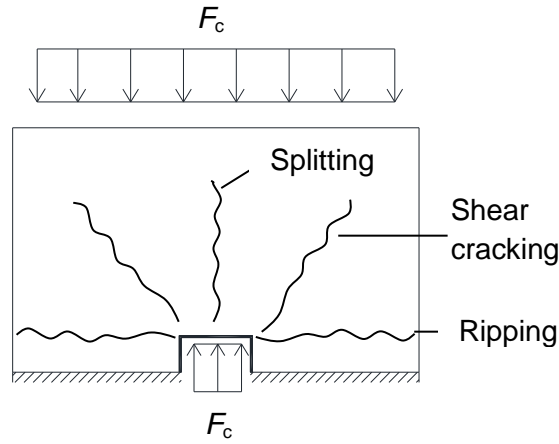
Potential failure modes of the DSC proposed (rebars not shown)
